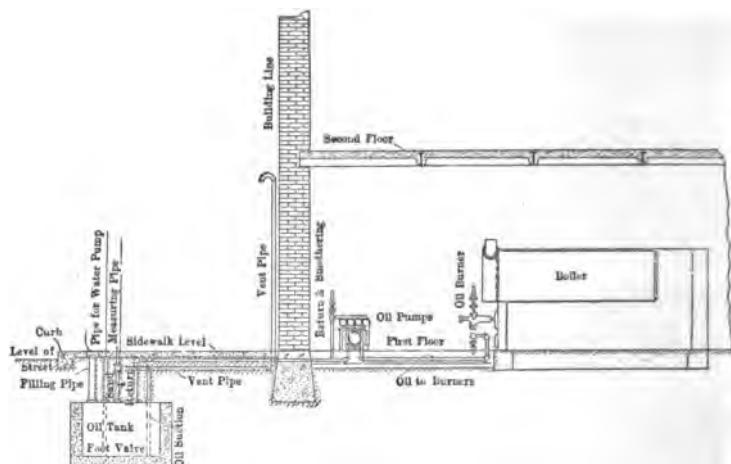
The view shows an oil tank below the level of the boiler room floor where the sidewalk has been excavated. The installation is agreeable to the Board of Fire Underwriters' specifications.
